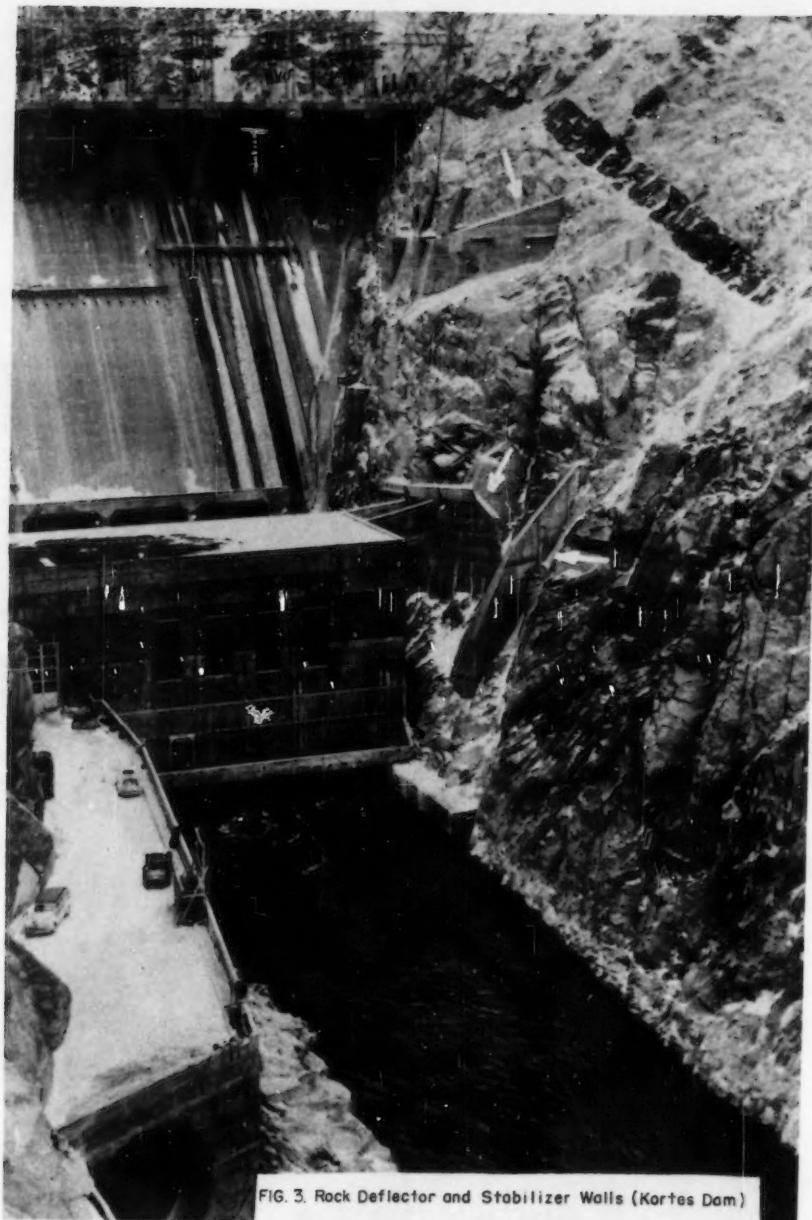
Rock Deflector and Stabilizer Walls (Kortes Dam)
